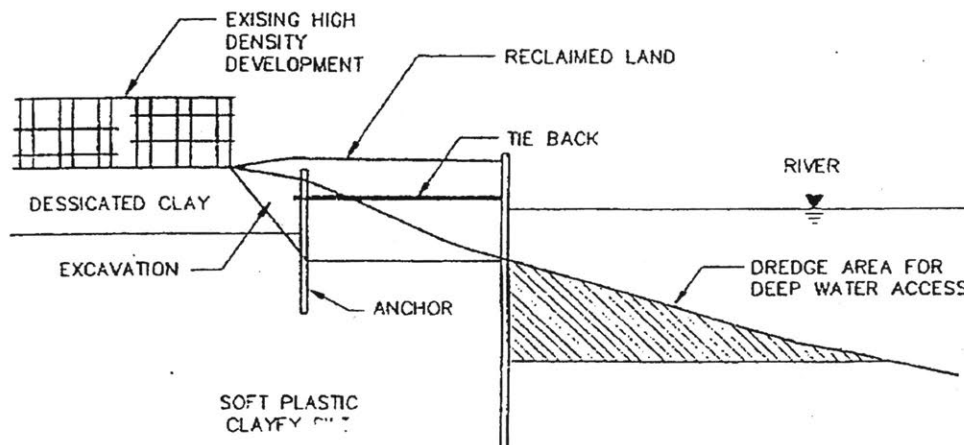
Typical floodwall section in urban area. FAP 8b (1991)
